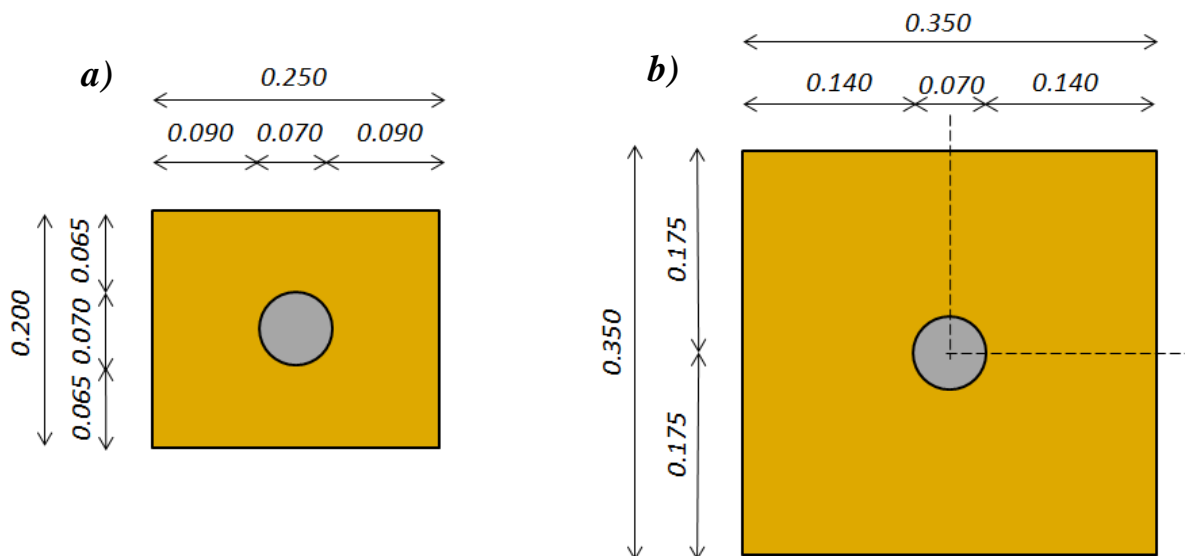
Small scale shallow foundations reinforced by single SM column, tested in the laboratory and modelled with finite element code; a) ‘small’ footing 0.20 m x 0.25 m and b) ‘big’ footing 0.35 m x 0.35 m (all dimensions in meters)
